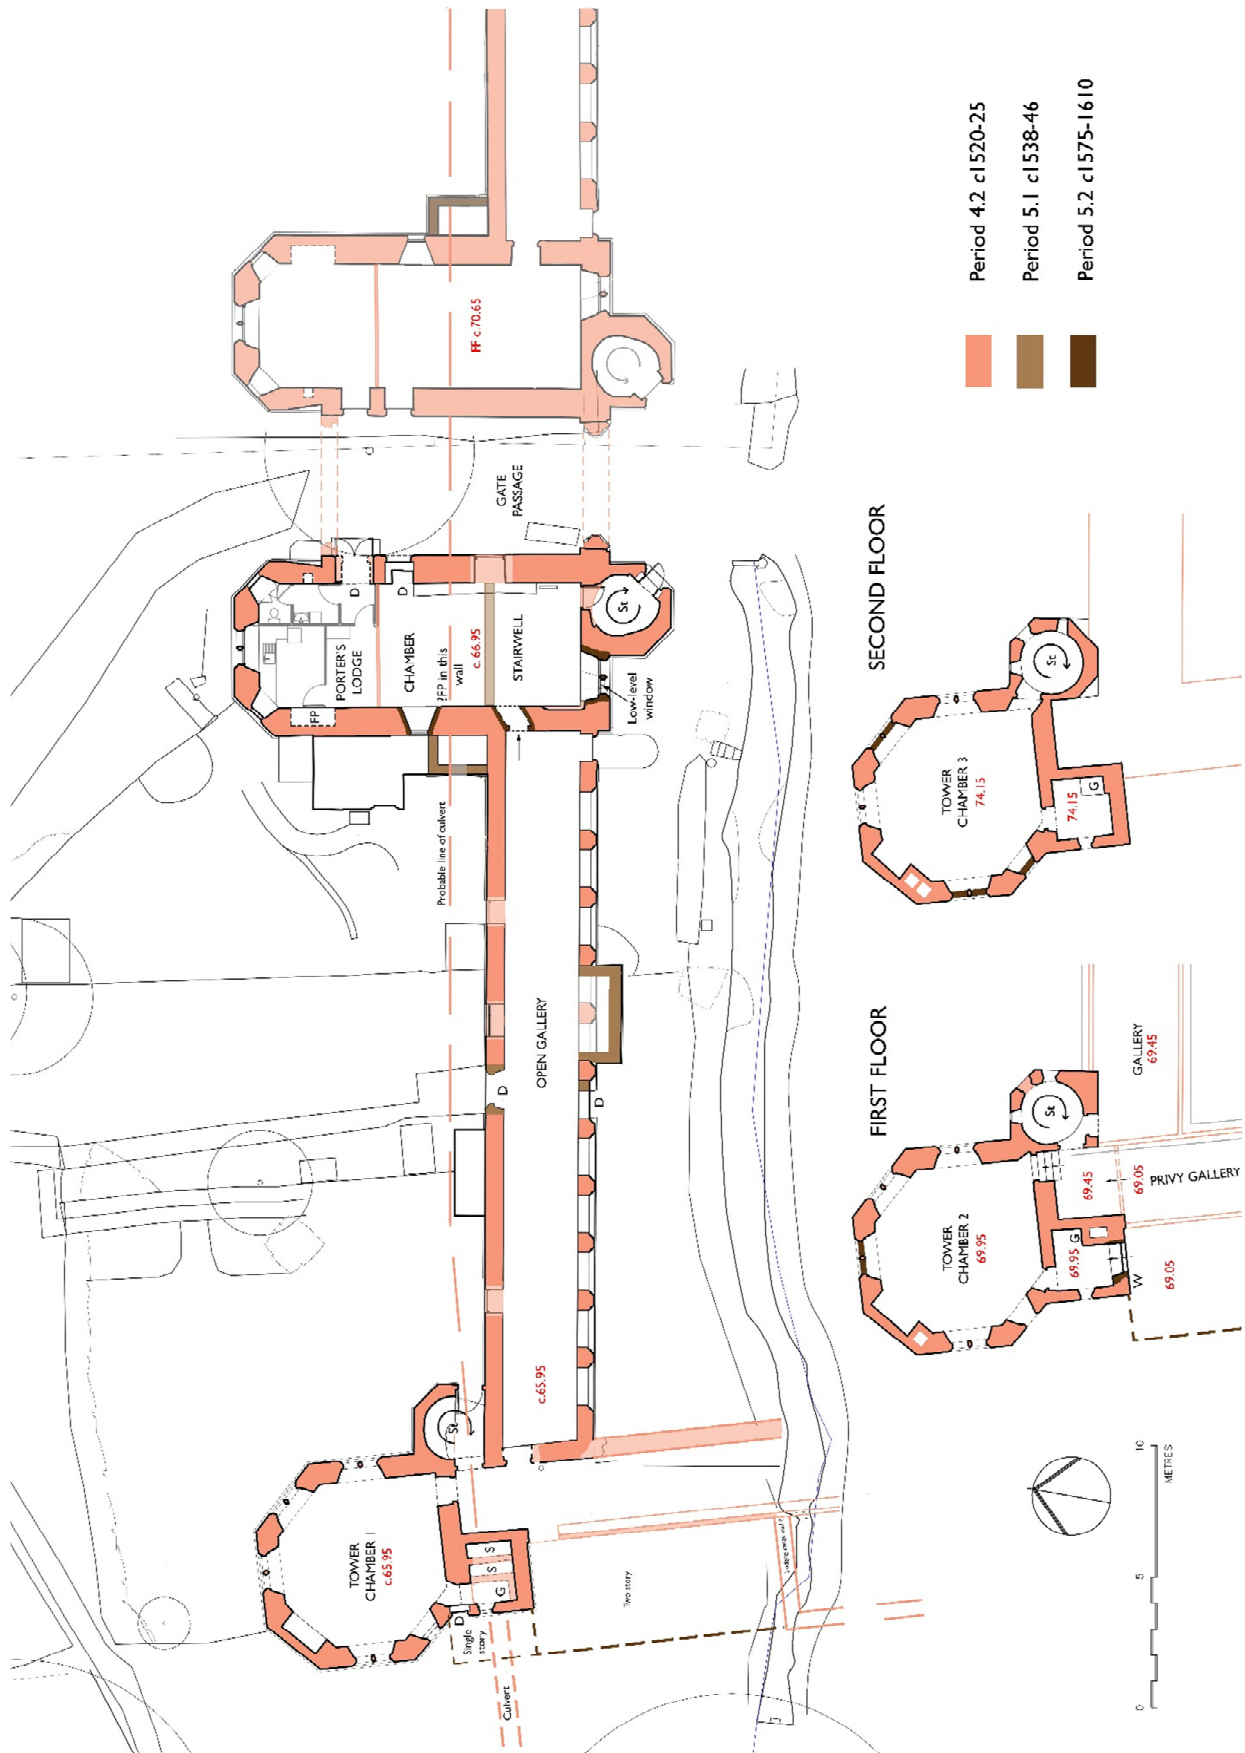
Phased and partly reconstructed ground plan of the surviving elements of the north outer courtyard range (base plan: TFP). Figures in red are historic floor levels in metres above Ordnance Datum Newlyn
